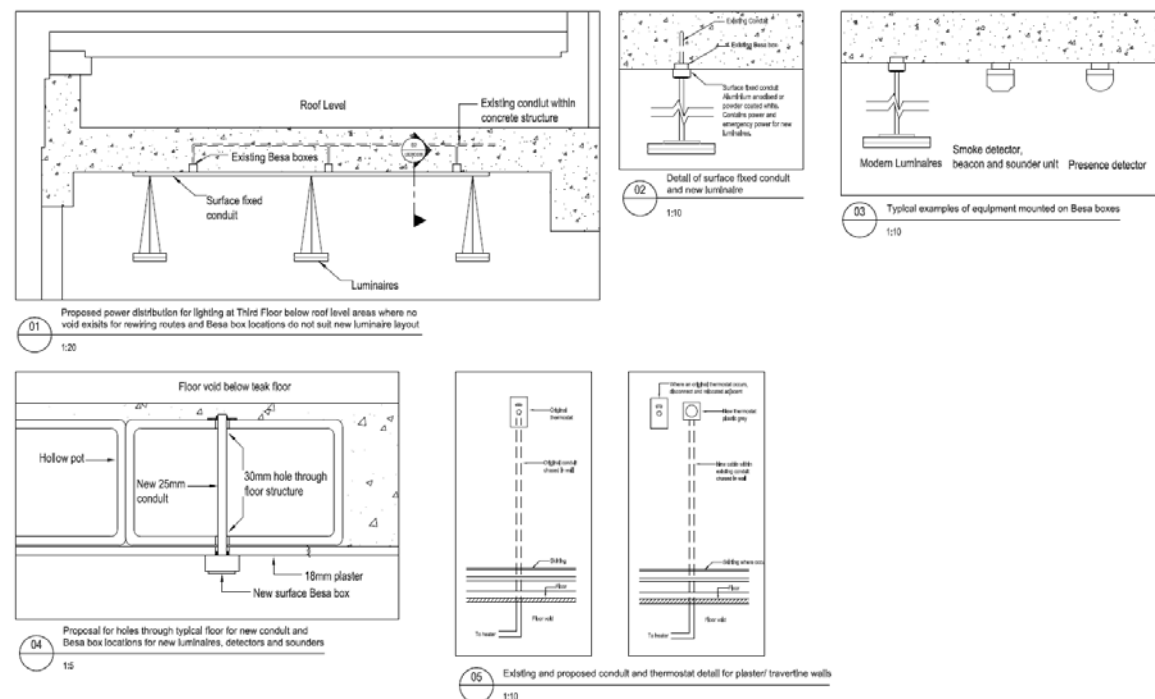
A drawing of the 2007 application (2007/0153/L) showing the existing and proposed electrical conduit in the ceiling of the third floor. Source: Camden Planning Portal.
